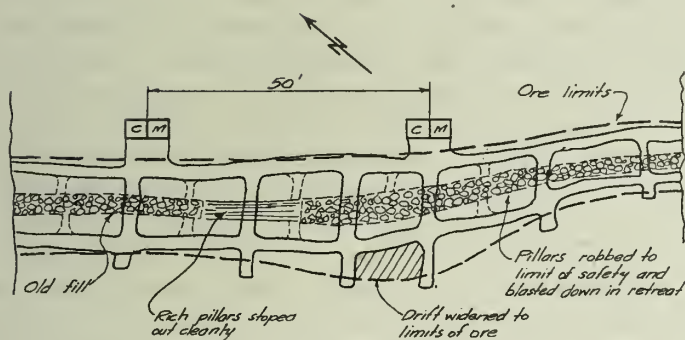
Typical caving sublevel, Pilar orebody, elevations 30, 37, 44, 54'
